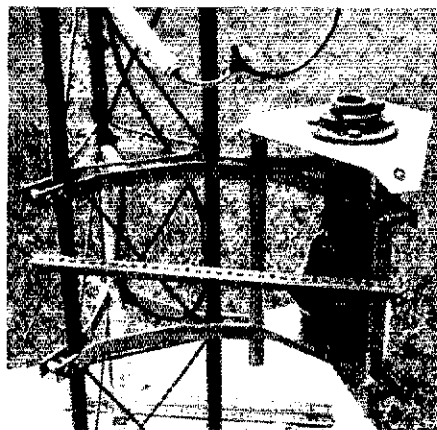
Rohn 25G short top section mounted outside the tower using Rohn guy-wire brackets. A length of 1½-inch angle stock braces the tower to the short top section to minimize stress where the bracket and the tower meet. A second piece of angle stock, used on the other side, had not yet been attached when this photo was taken.
